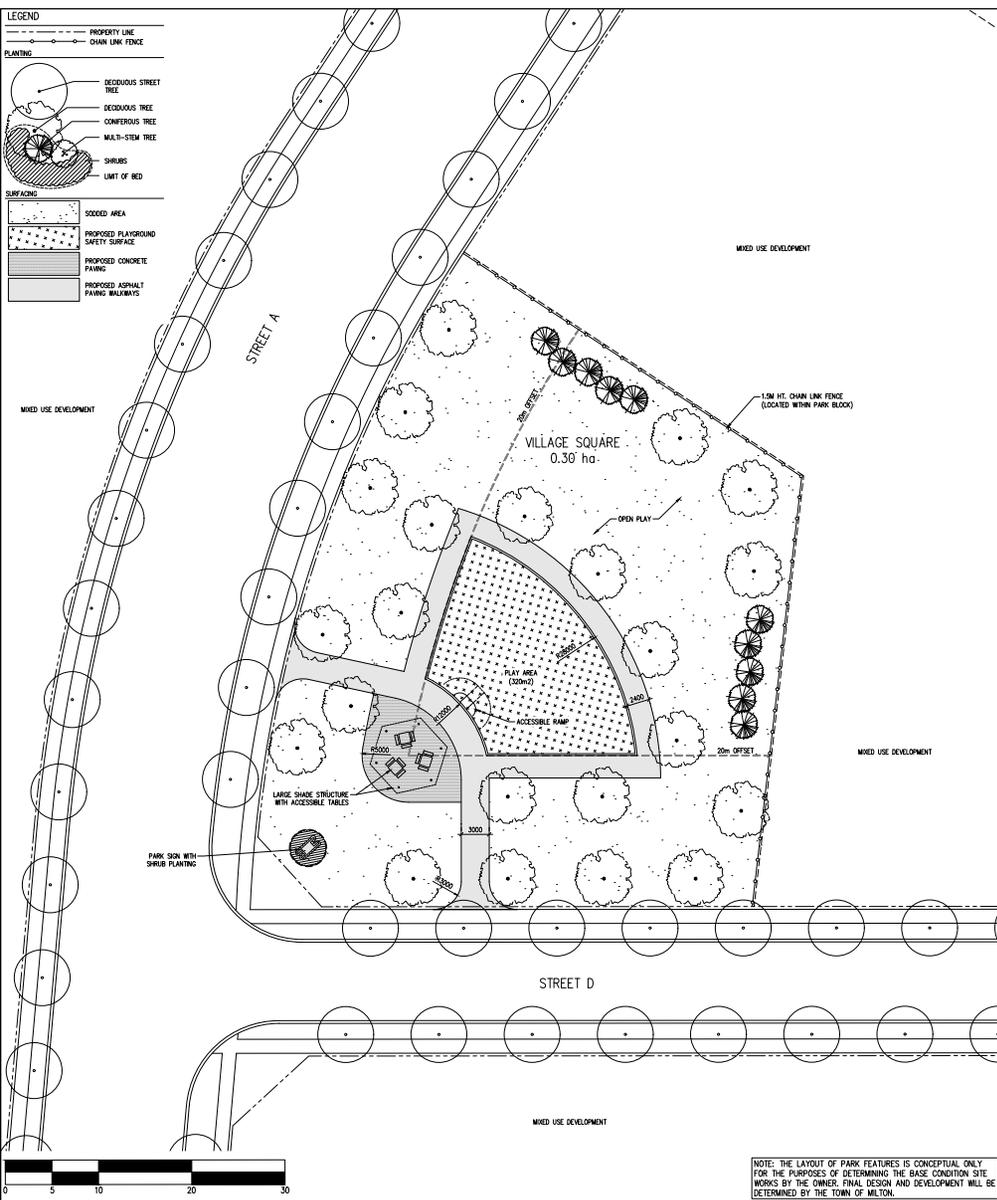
Conceptual Park Type 2 facility fit plan
